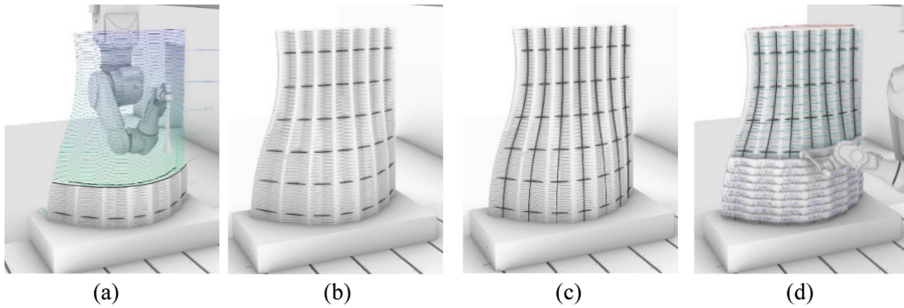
Built-up strategy; (a): printing of the undulated core and placement of the horizontal pre-bent reinforcement bars; (b): printed core with horizontal reinforcement at full height; (c): inserted vertical reinforcement; (d): covering the reinforcement with an additional layer of shotcrete.
